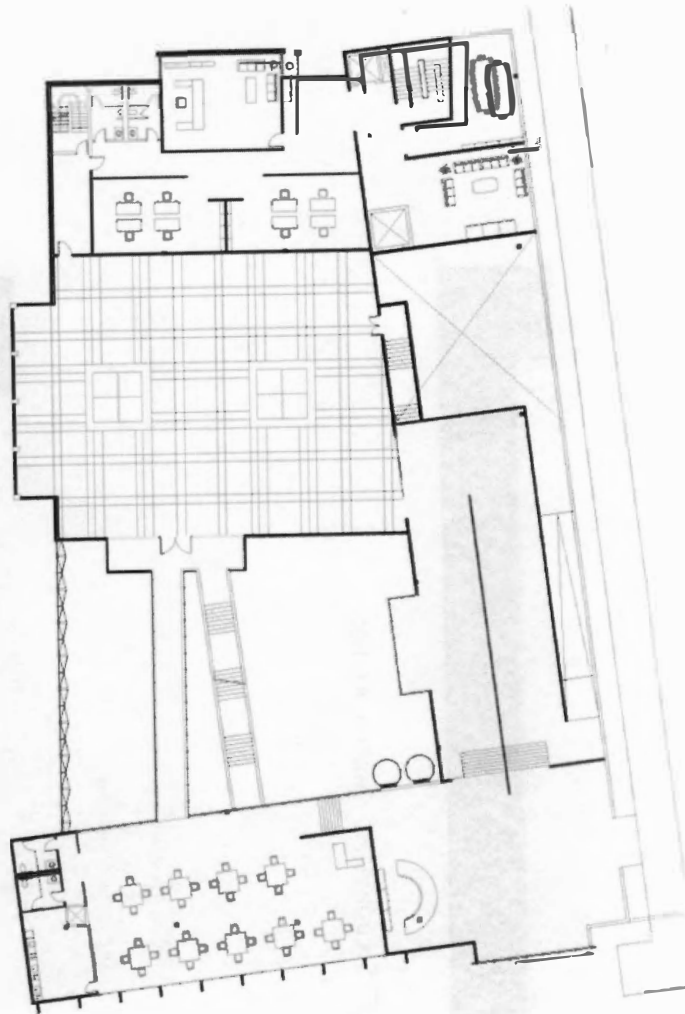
3<sup>rd</sup> Floor Plan Source: Author
